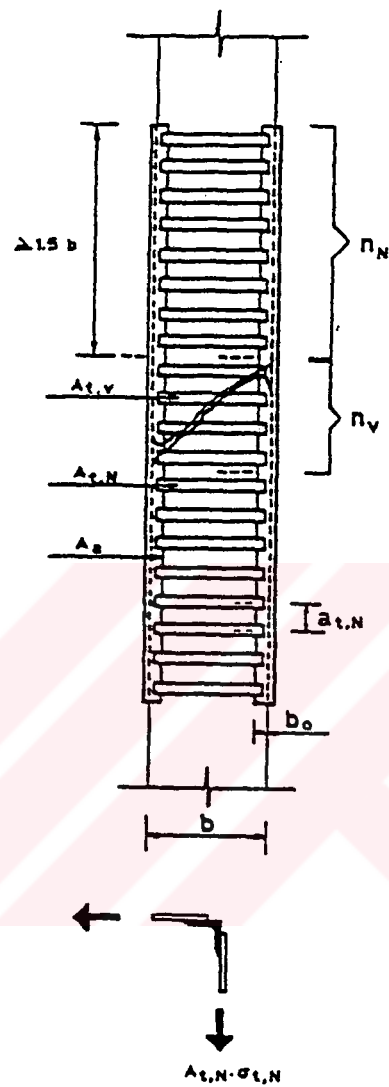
Construction technique for strengthening by lightsteel profiles
